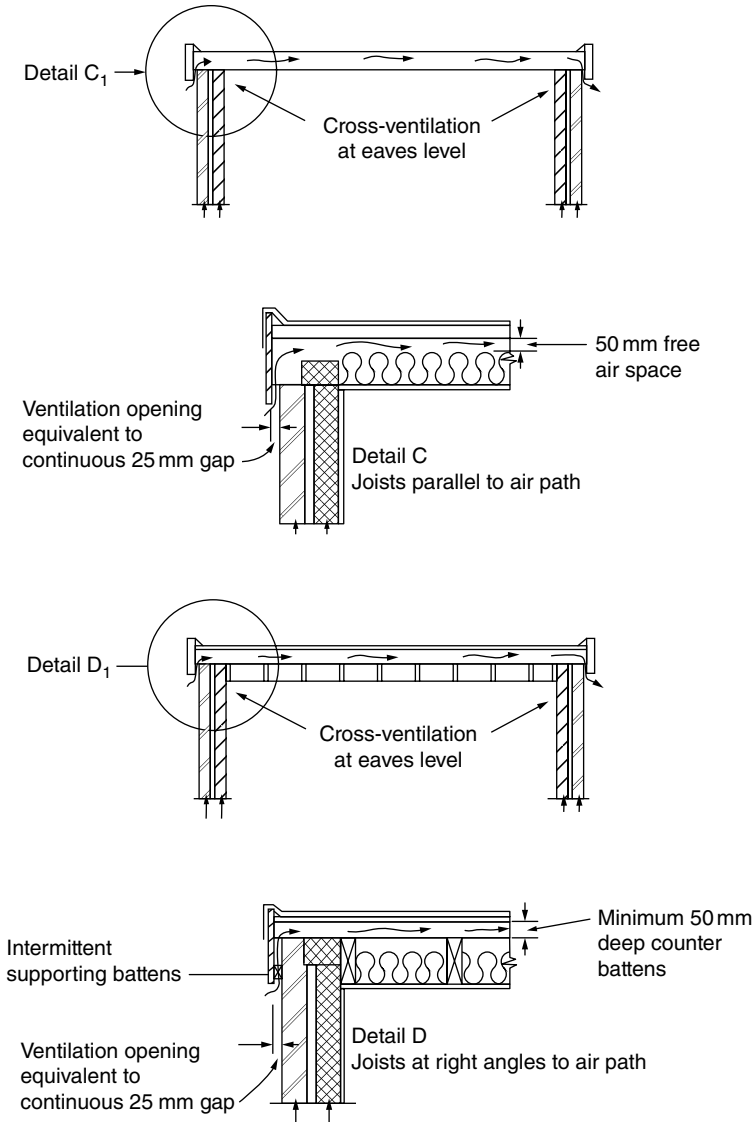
Roof void ventilation – roofs pitched at less than 15°. A free airspace of at least 50 mm should be provided between the roof deck and the insulation. This may need to be formed using counter-battens if the joists run at right angles to the flow of air (see Fig. 8.18). Where it is not possible to provide proper cross-ventilation, an alternative form of roof construction should be considered. It is possible to install vapour checks (called vapour control layers in BS 5250) at ceiling level using polythene or foil-backed plasterboard to reduce the amount of moisture reaching the roof void. This is not acceptable as an alternative to ventilation unless a complete vapour barrier is installed.
